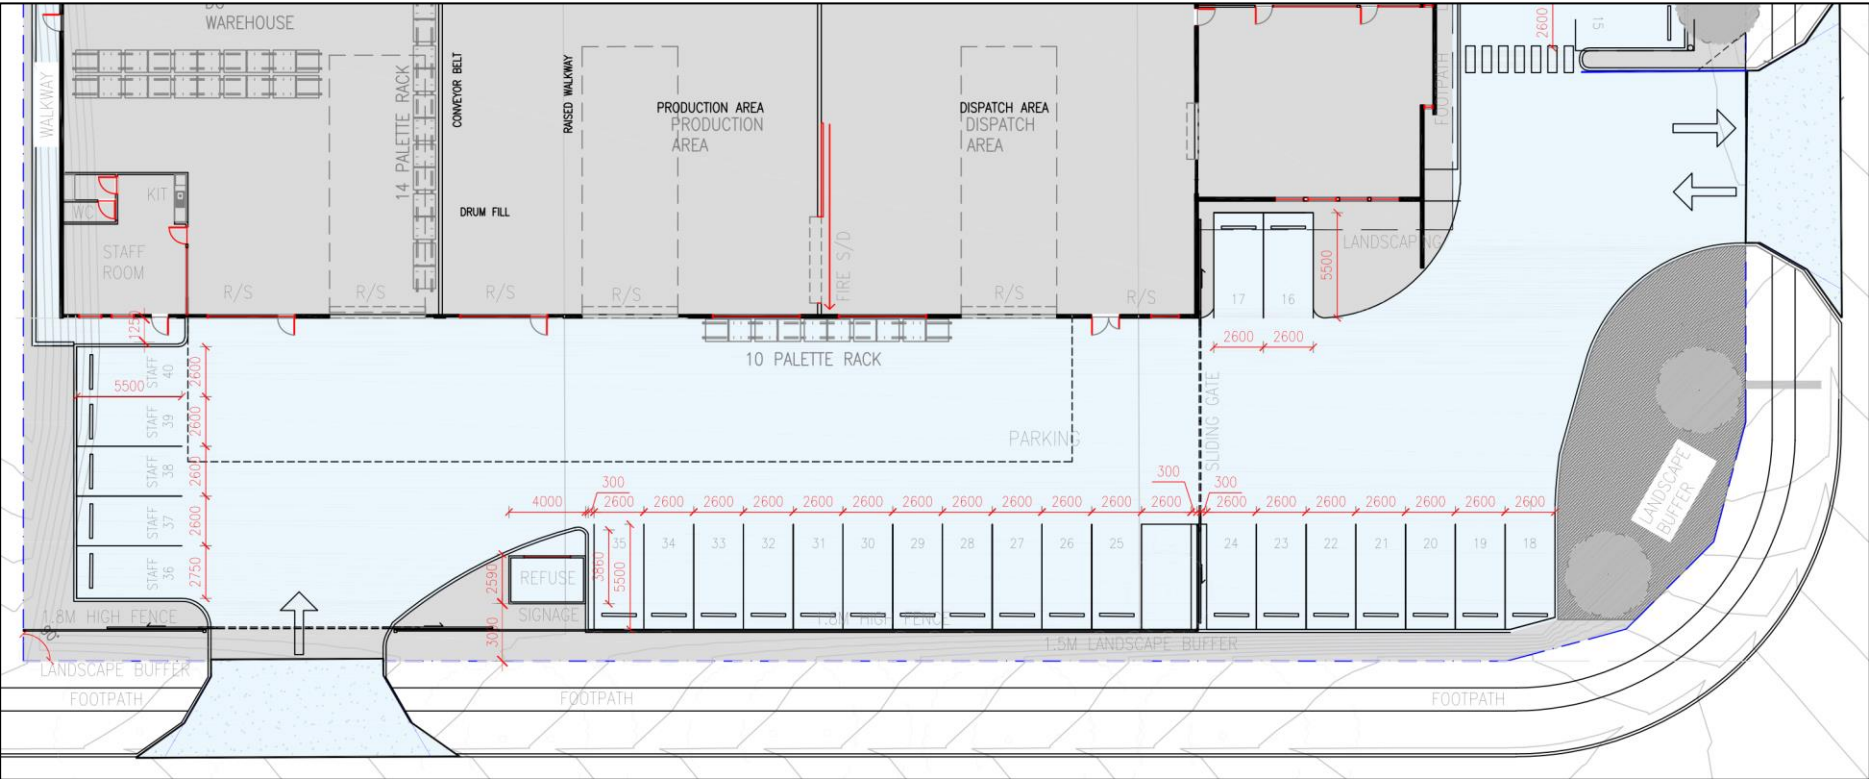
DIMENSIONED CAR PARKING LAYOUT (SOUTHERN CAR PARK)
